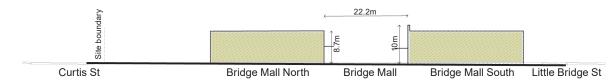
Built form test of street wall, setback and upper level heights- Section F
